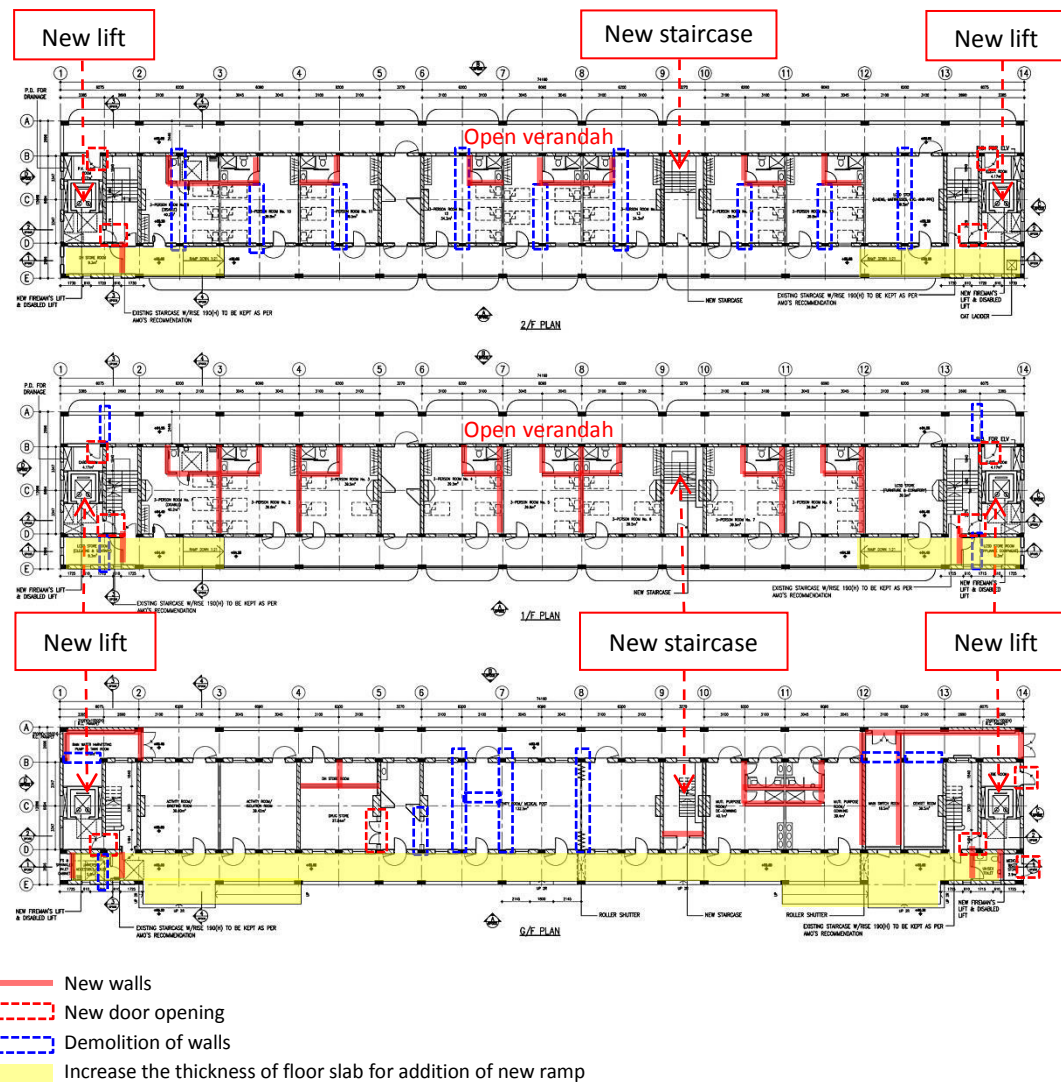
Site Plan (Source: Architectural Services Department) Edited by Hannah Liu
